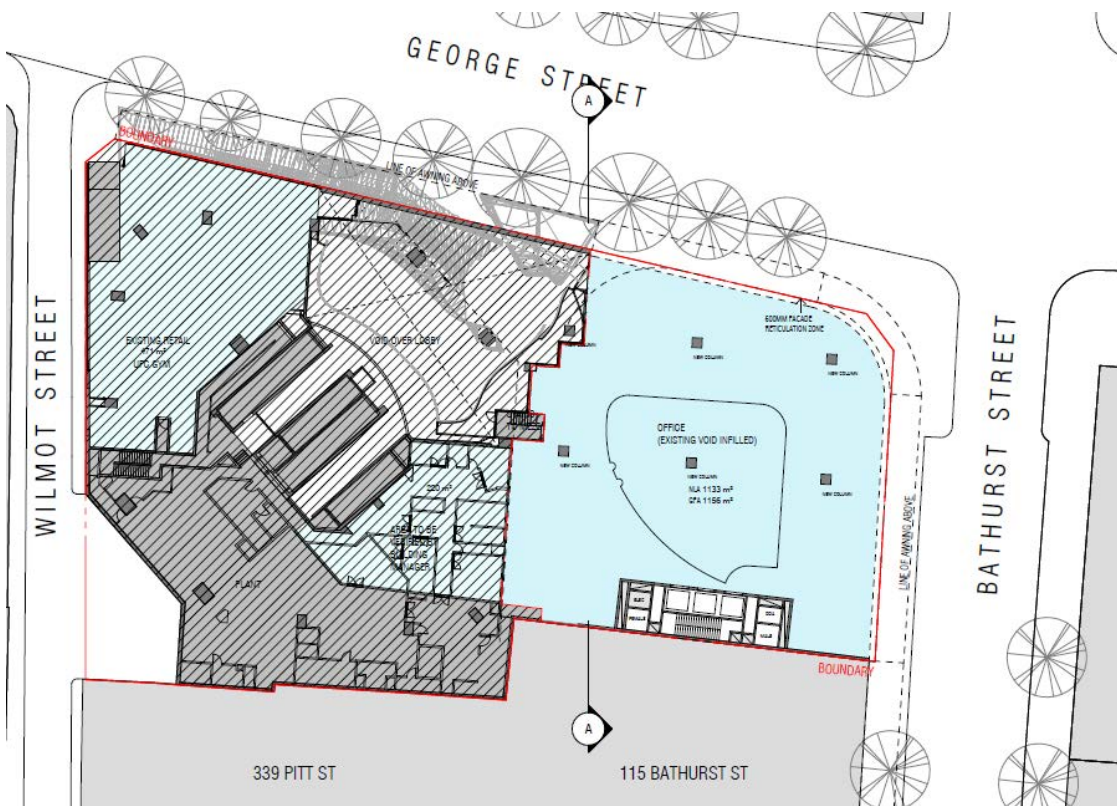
Extract of proposed plans showing proposed Mezzanine Floor Plan.
